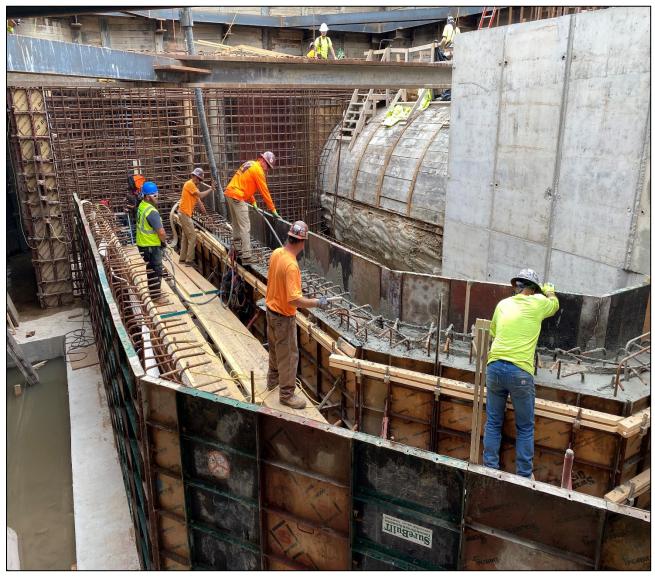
Setting Concrete Wall forms @ East side of Beaconsfield Shaft
